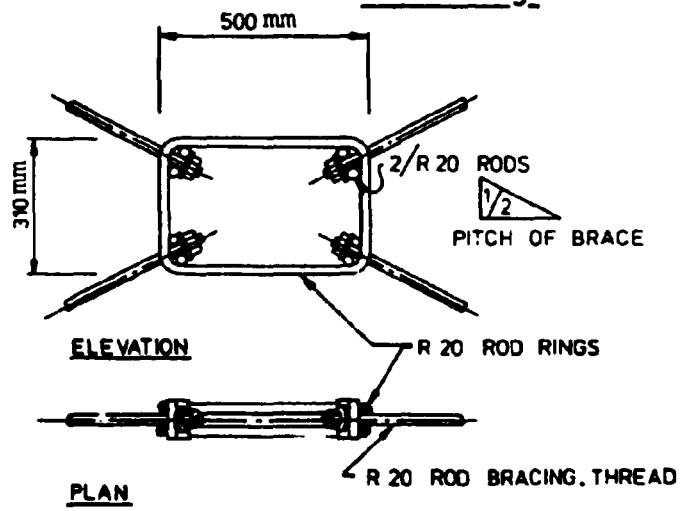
Detail of a Yielding Steel Bracing System in a Building in New Zealand
